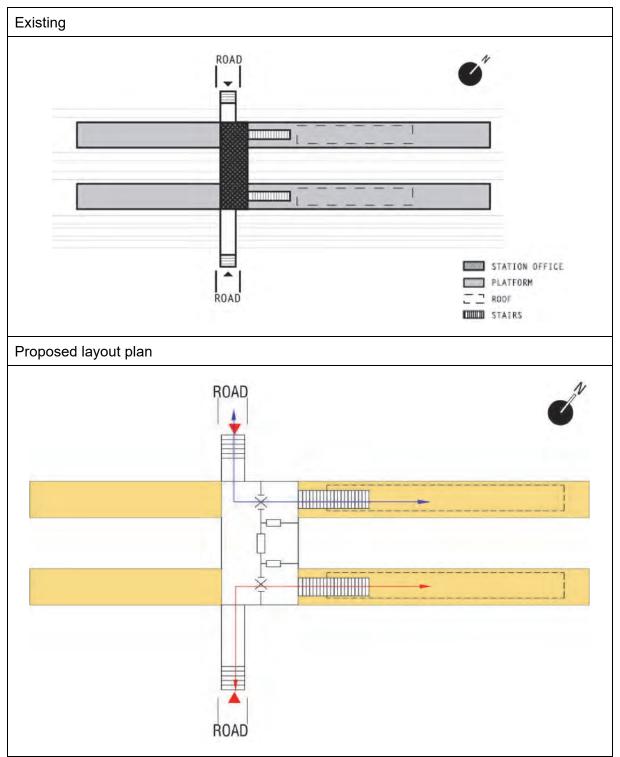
Existing and Proposed Layout Plan (Thamine Station)
